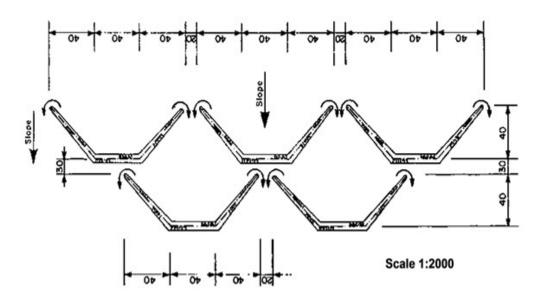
Layout of Trapezoidal Bund. (Source: Barron and Salas, 2009)
